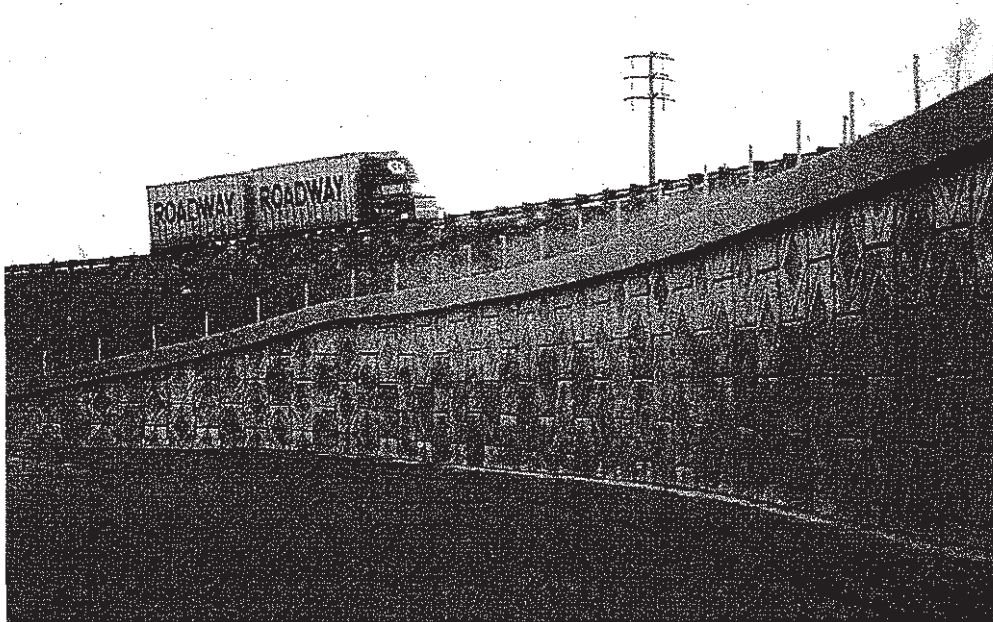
View of Reinforced Earth Wall at Lyons Avenue after the Northridge Earthquake
